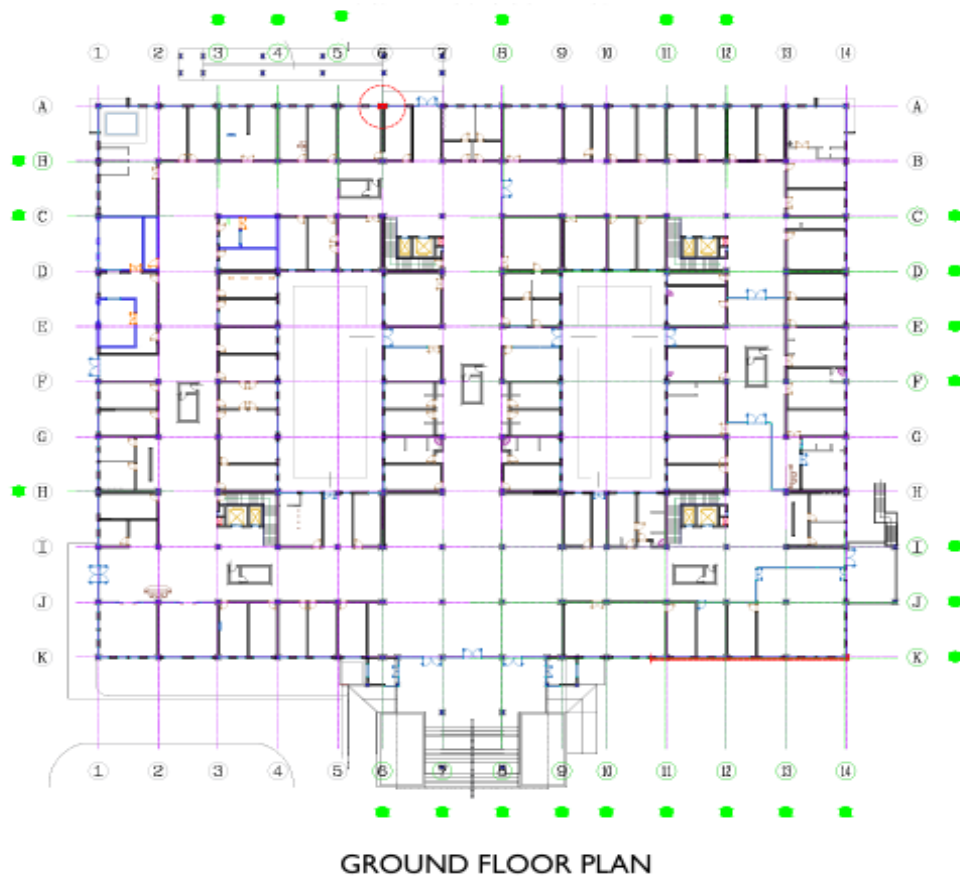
Architectural Design of the Column Deflection for Ground Floor Plan
